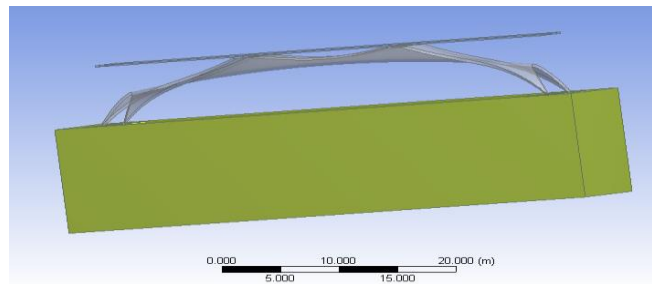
Shell supported bridge with soil block modelled in AUTOCAD 2015
